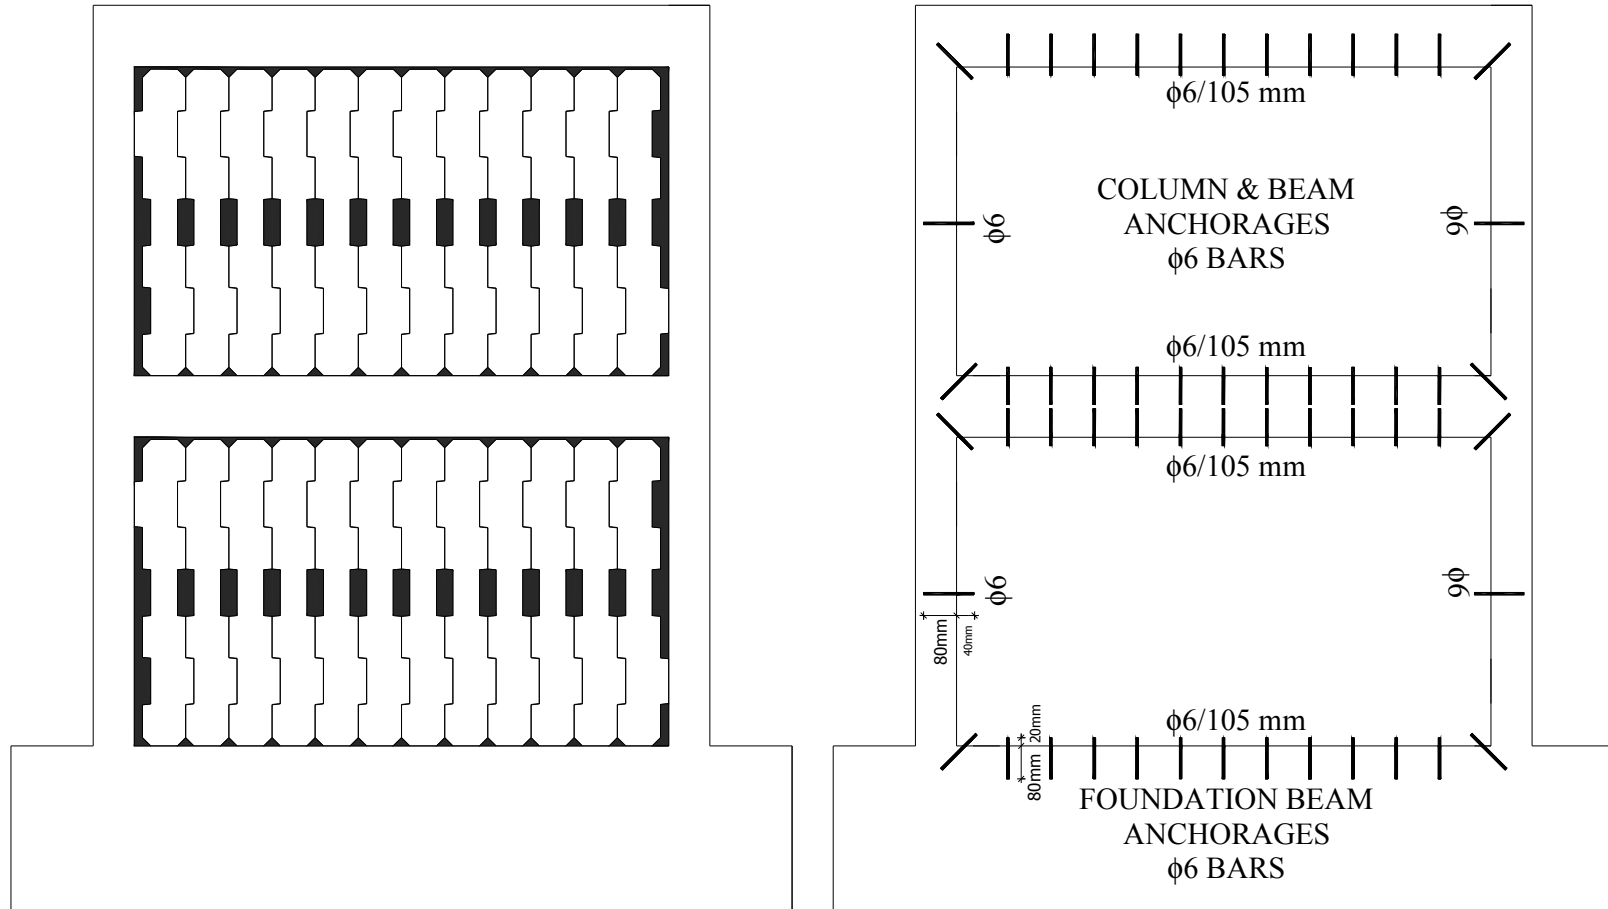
Panel arrangement and configuration of the dowels for Specimen CIB4
